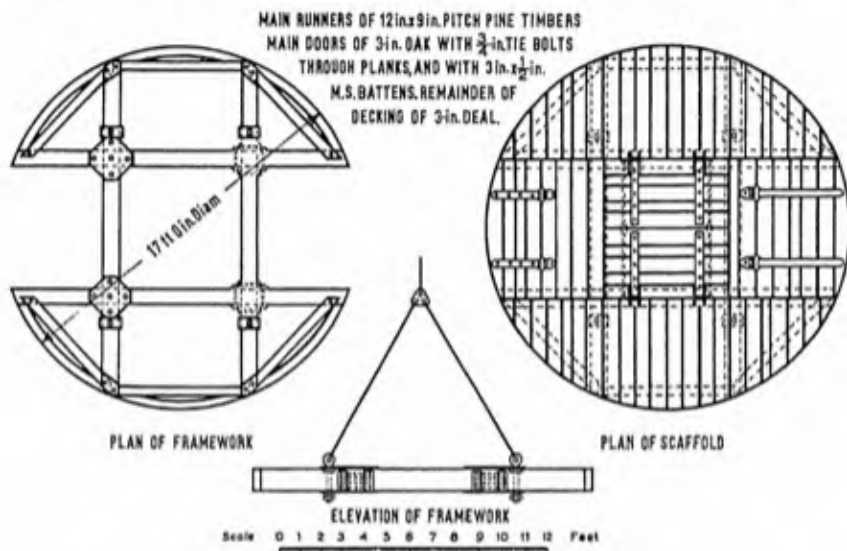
SINKING SCAFFOLD USED AT BROOKHOUSE SINKING
